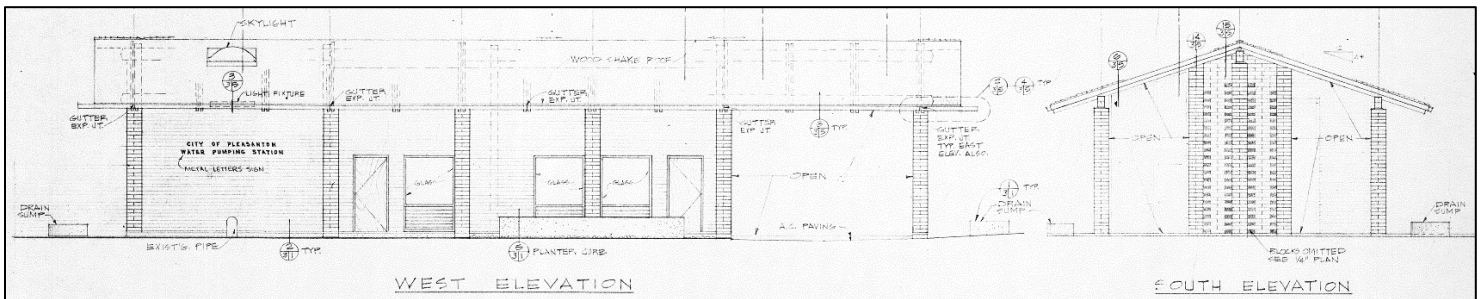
Original construction plans (1967) showing the west and south elevations of the proposed pump station.²⁸
